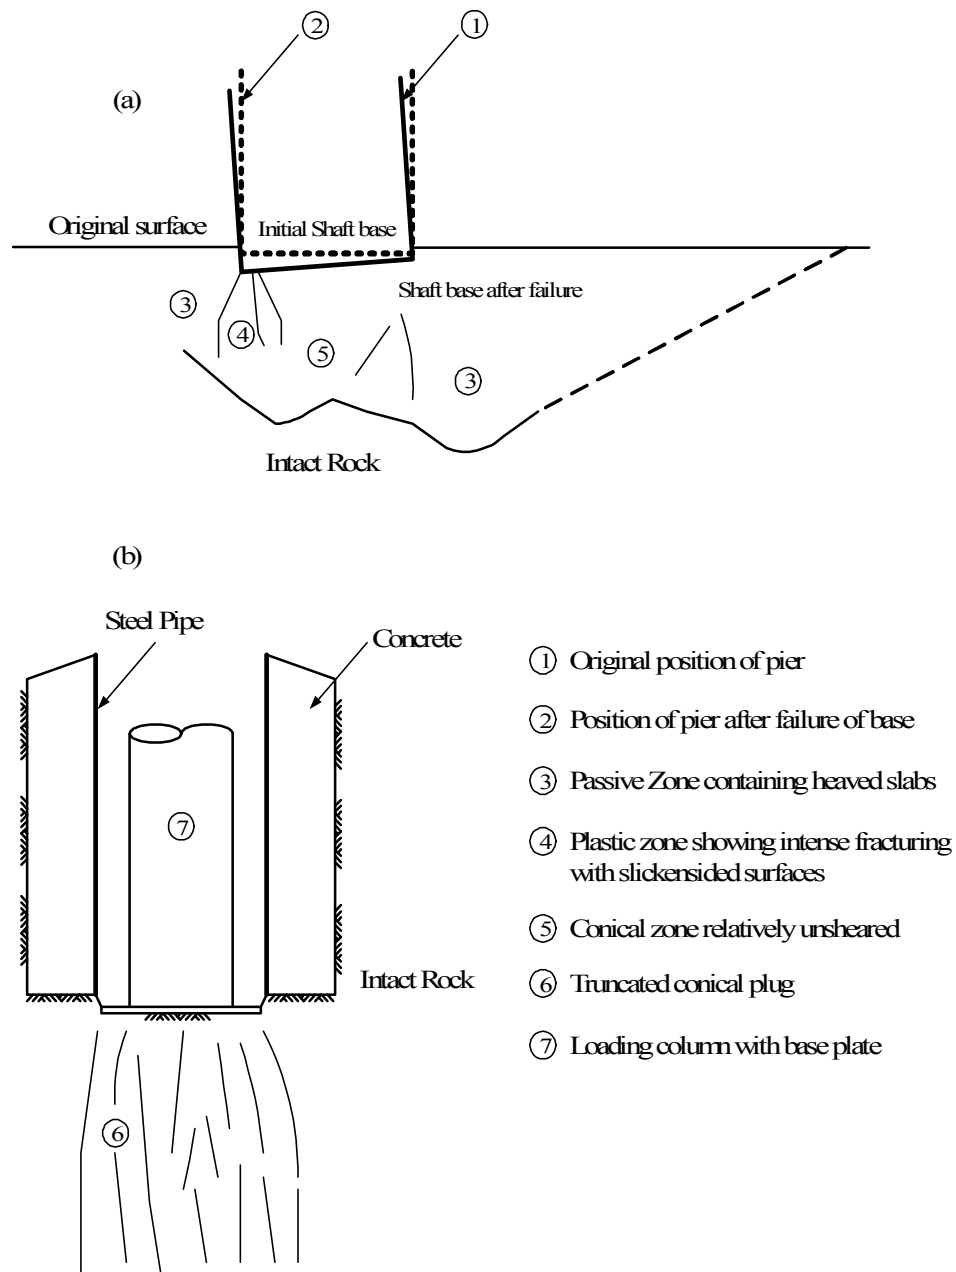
Typical failure mechanism for end-bearing piles (Williams et al., 1980): (a) base of pier bearing at ground surface; and (b) socketed pier with length/diameter  $> 2$
